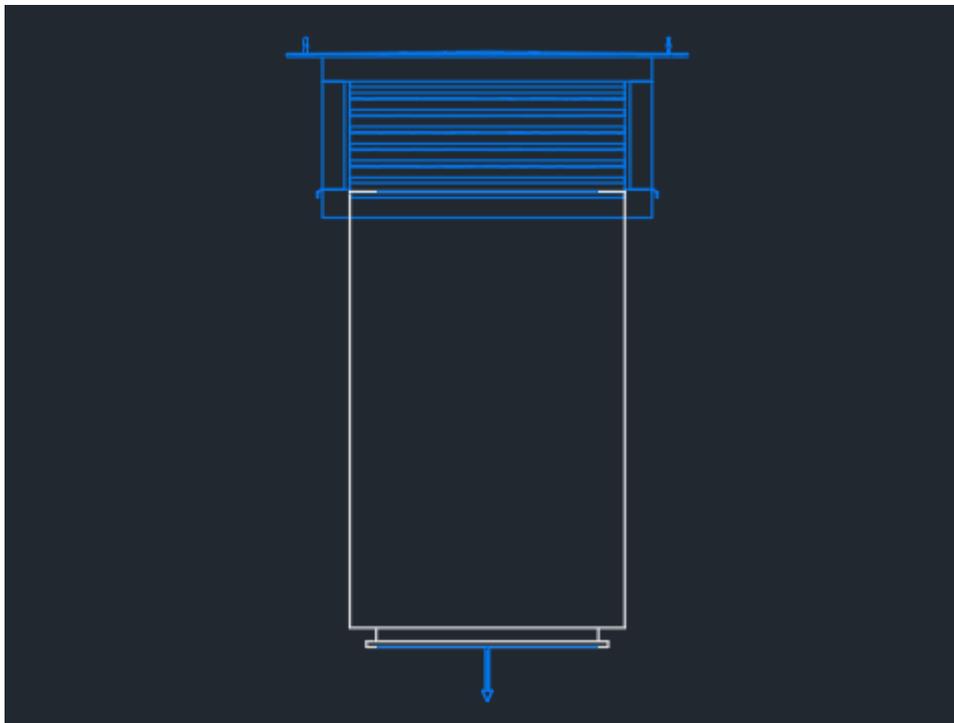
Outdoor supply roof hood and inlet products 3D geometry in AutoCAD drawing
